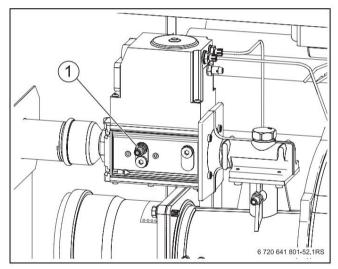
Checking the internal tightness (boiler sizes 200 to 280 kW)
